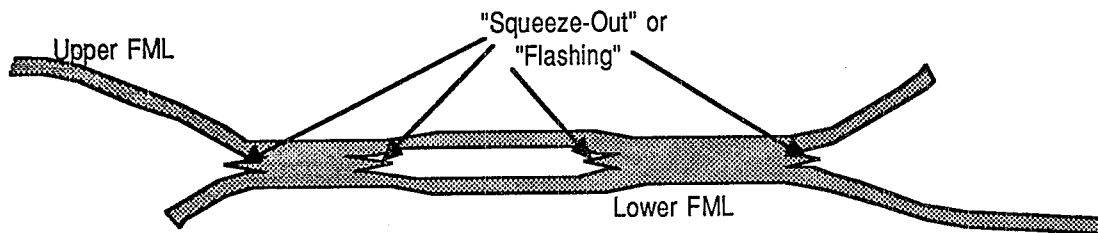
Schematic Diagram of Cross Section of Dual (Spilt) Hot Wedge Seam Illustrating Squeeze-Out
